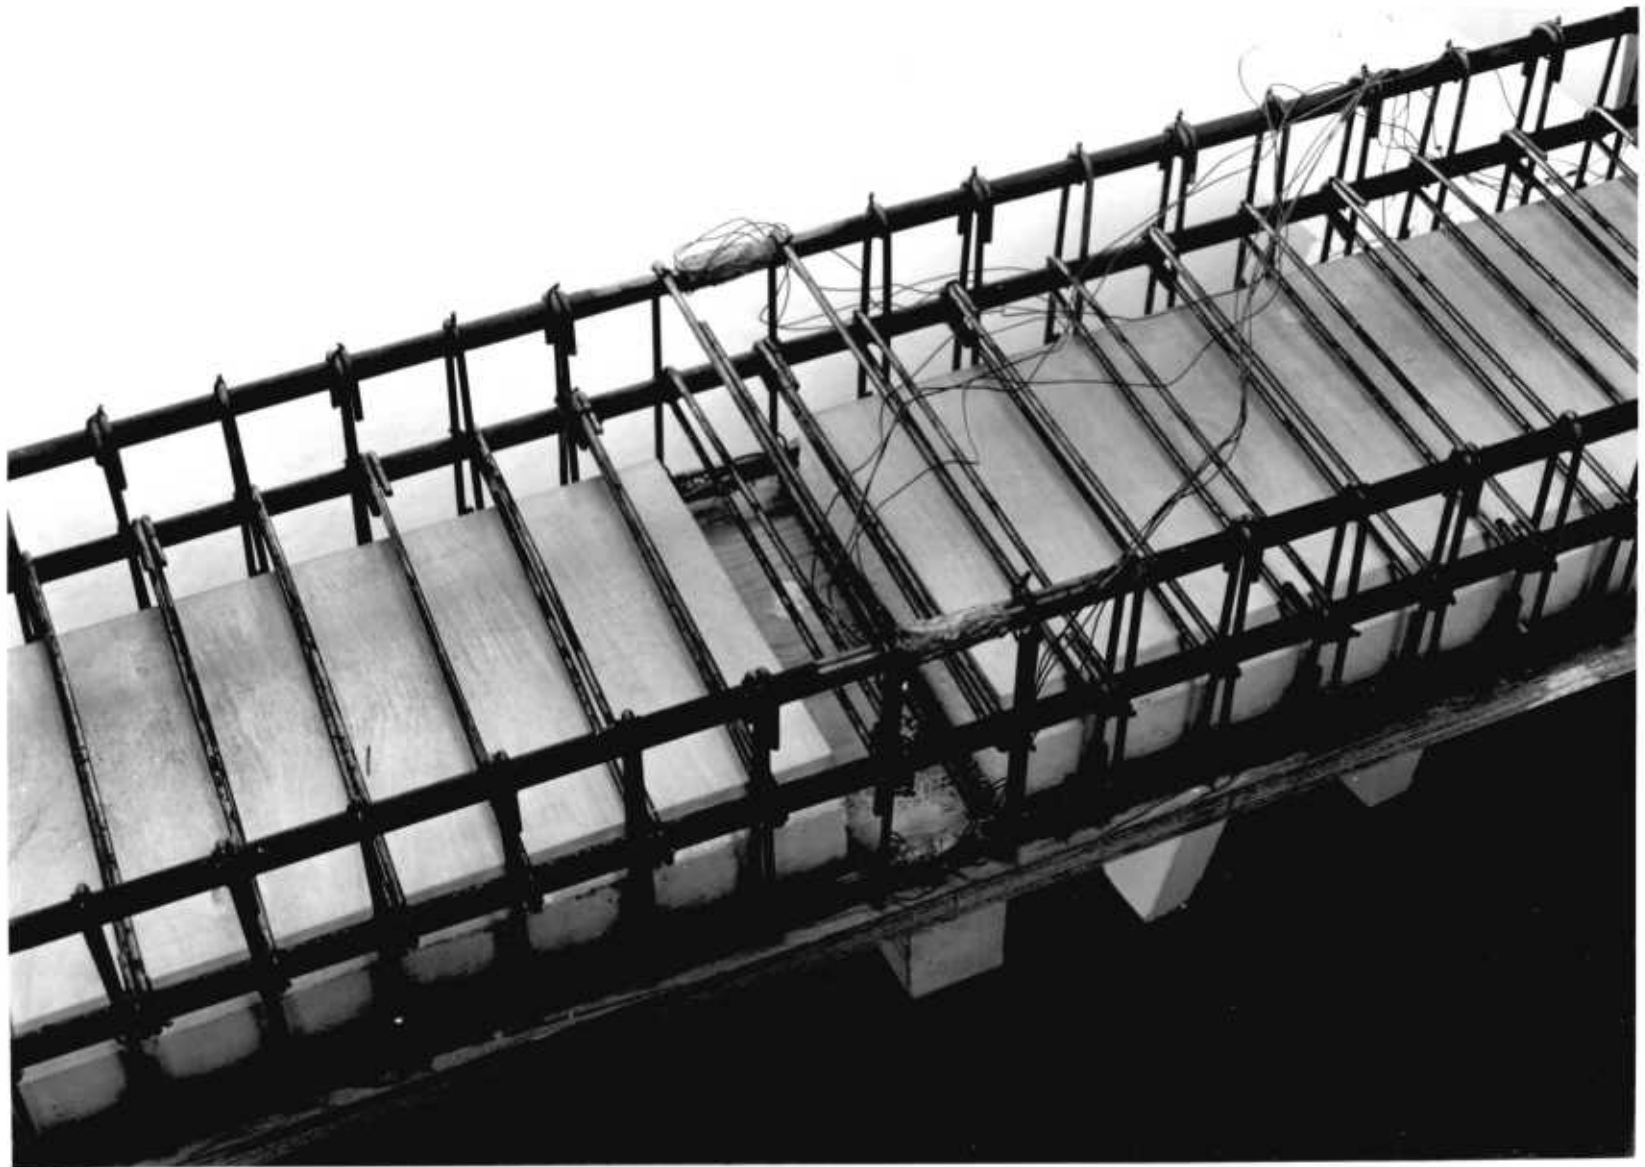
I-Section with Double Stirrup Reinforcement.
